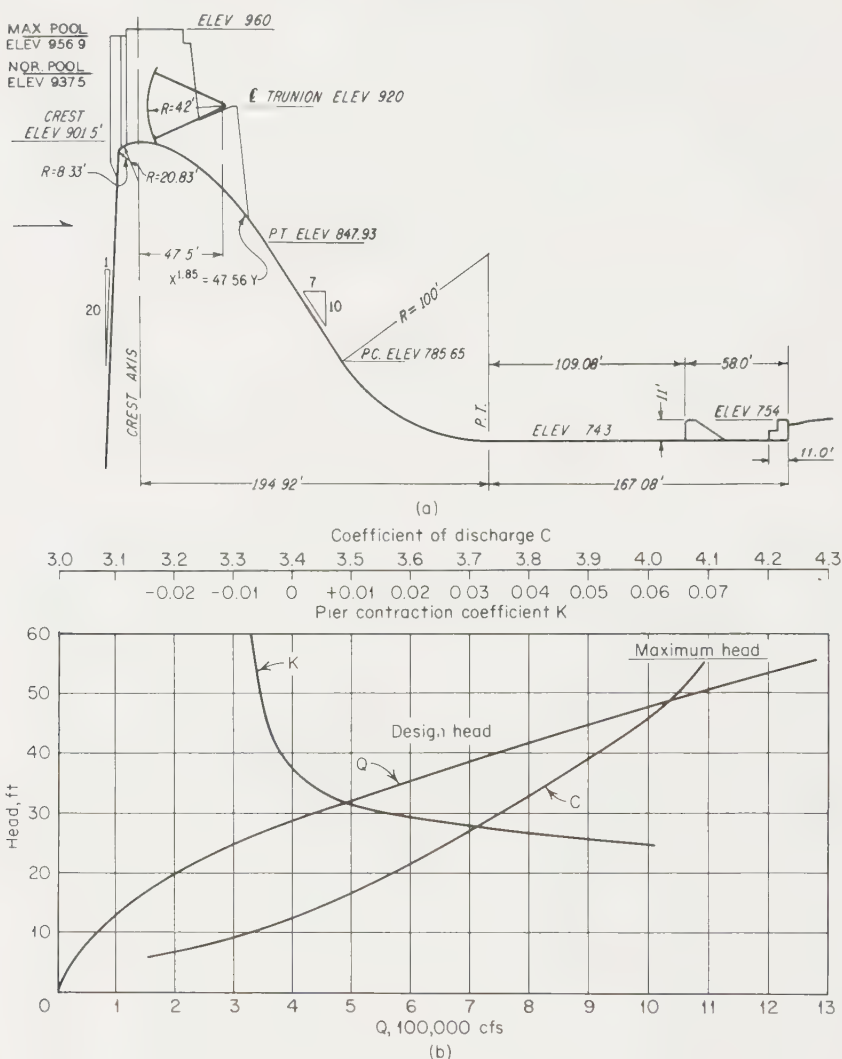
Chief Joseph spillway. (a) Section of spillway. (b) Characteristics.
